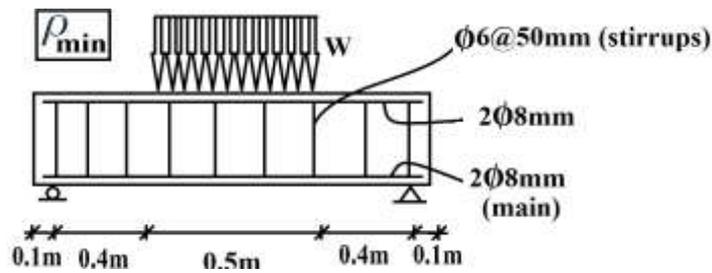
Reinforcement, geometry and loading of the beam Dist-min
